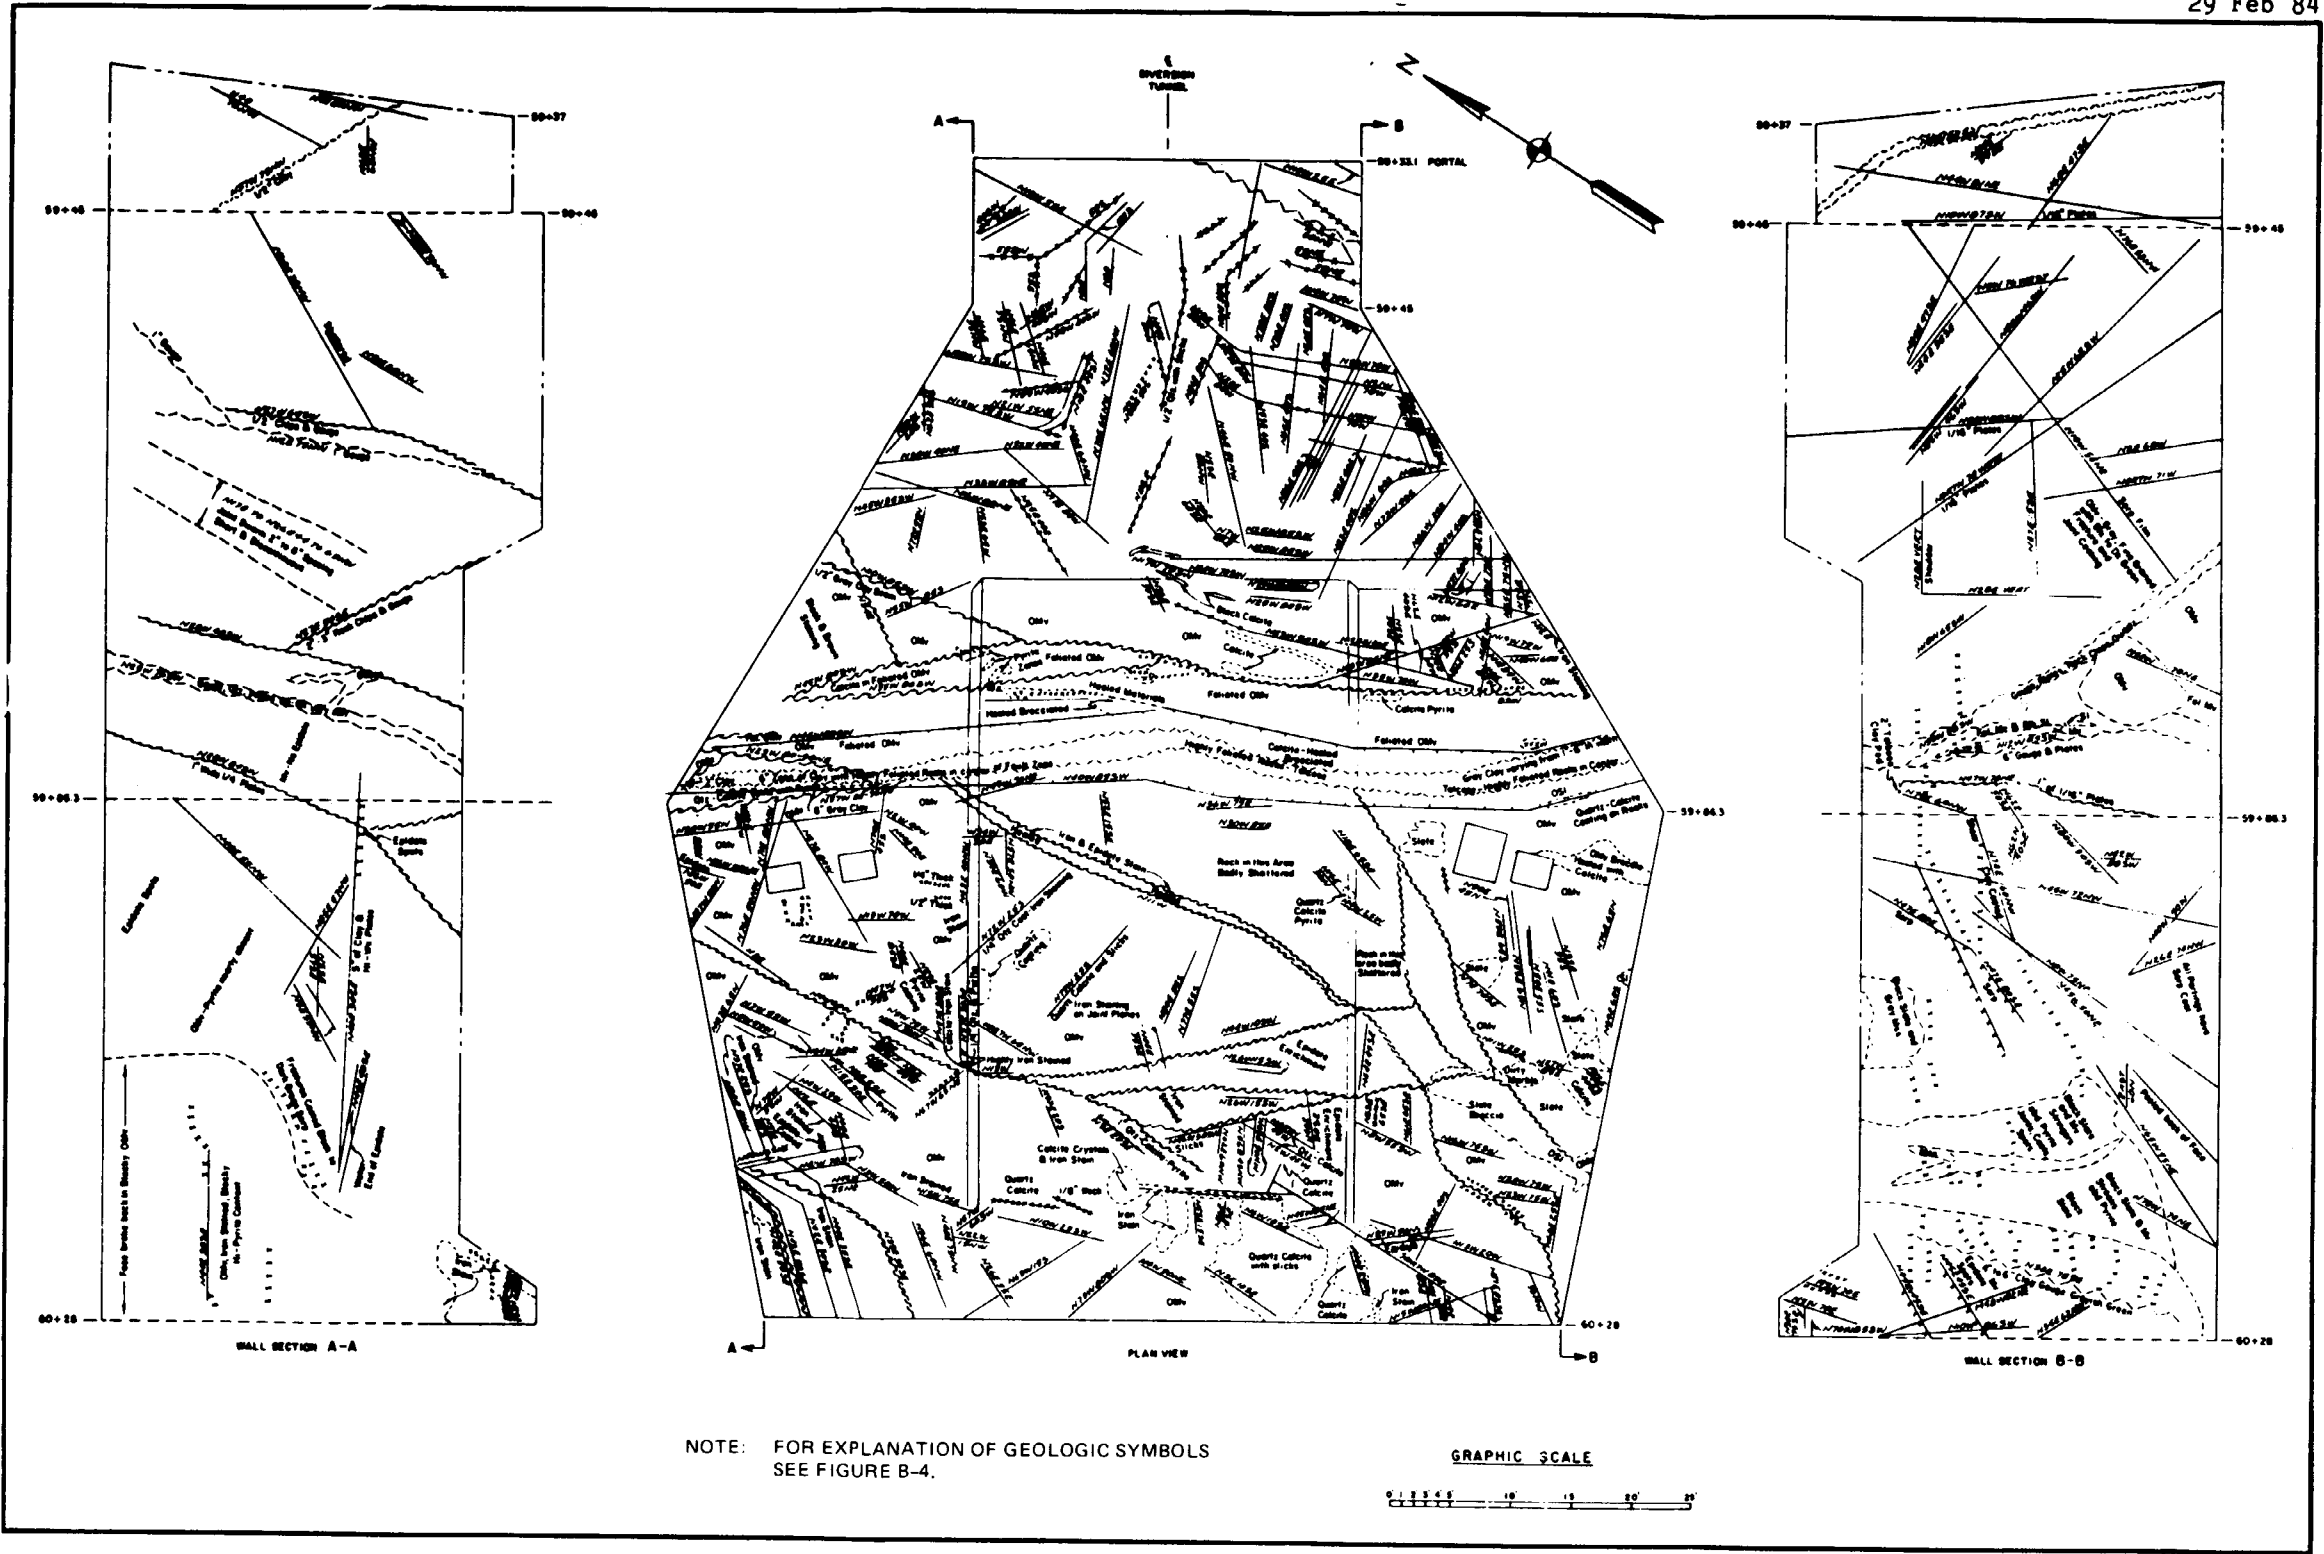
Foundation map for concrete structure on metamorphic rocks
